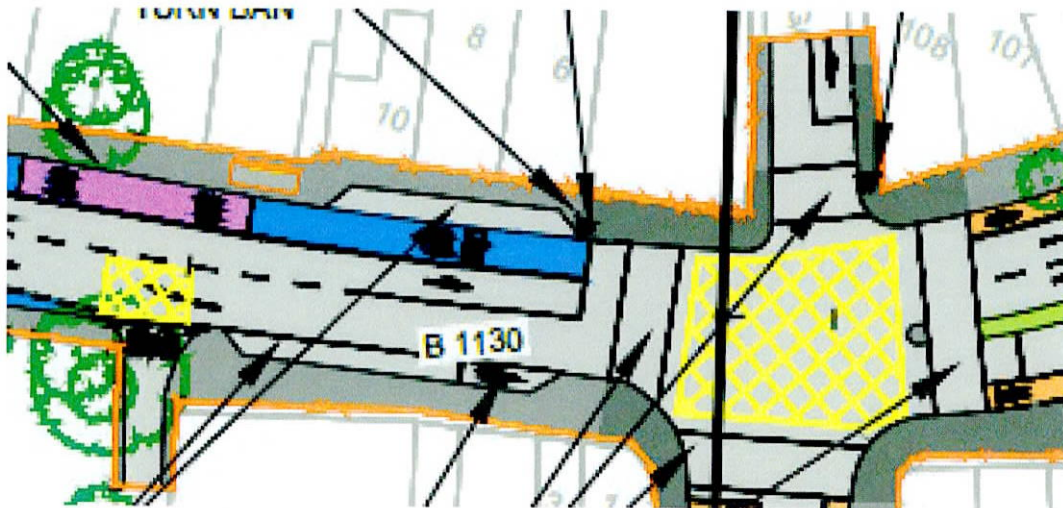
Extract from Sheet 10 of the General Arrangement drawing illustrating the new bus shelter and stop (in pink) and the intersection of Terenure Road East and Rathgar Avenue/Orwell Road.
